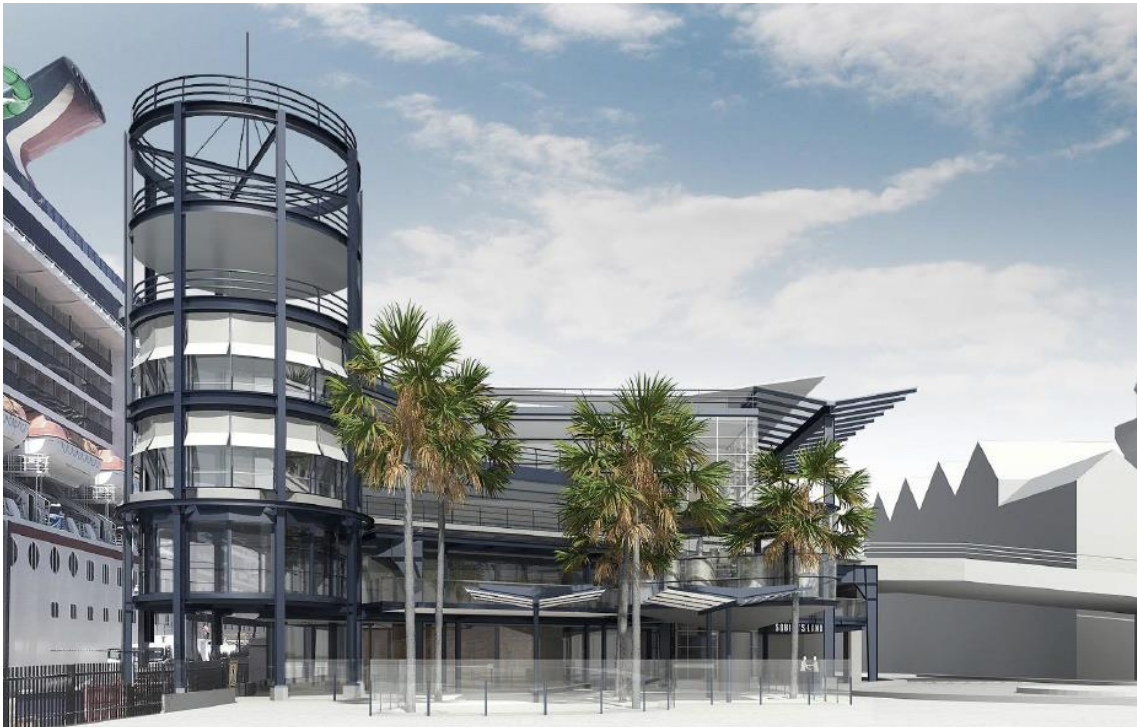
Proposed shade structures – Indicative north elevation (Source: Greenlight Design)
